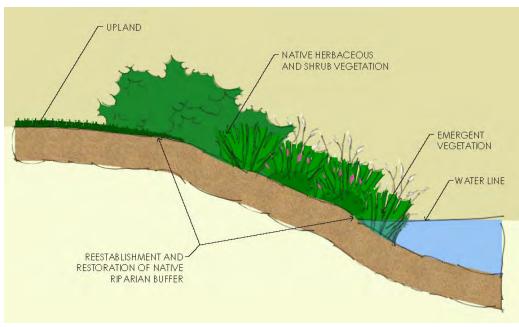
Typical Bank Restoration Planting for Small Streams
